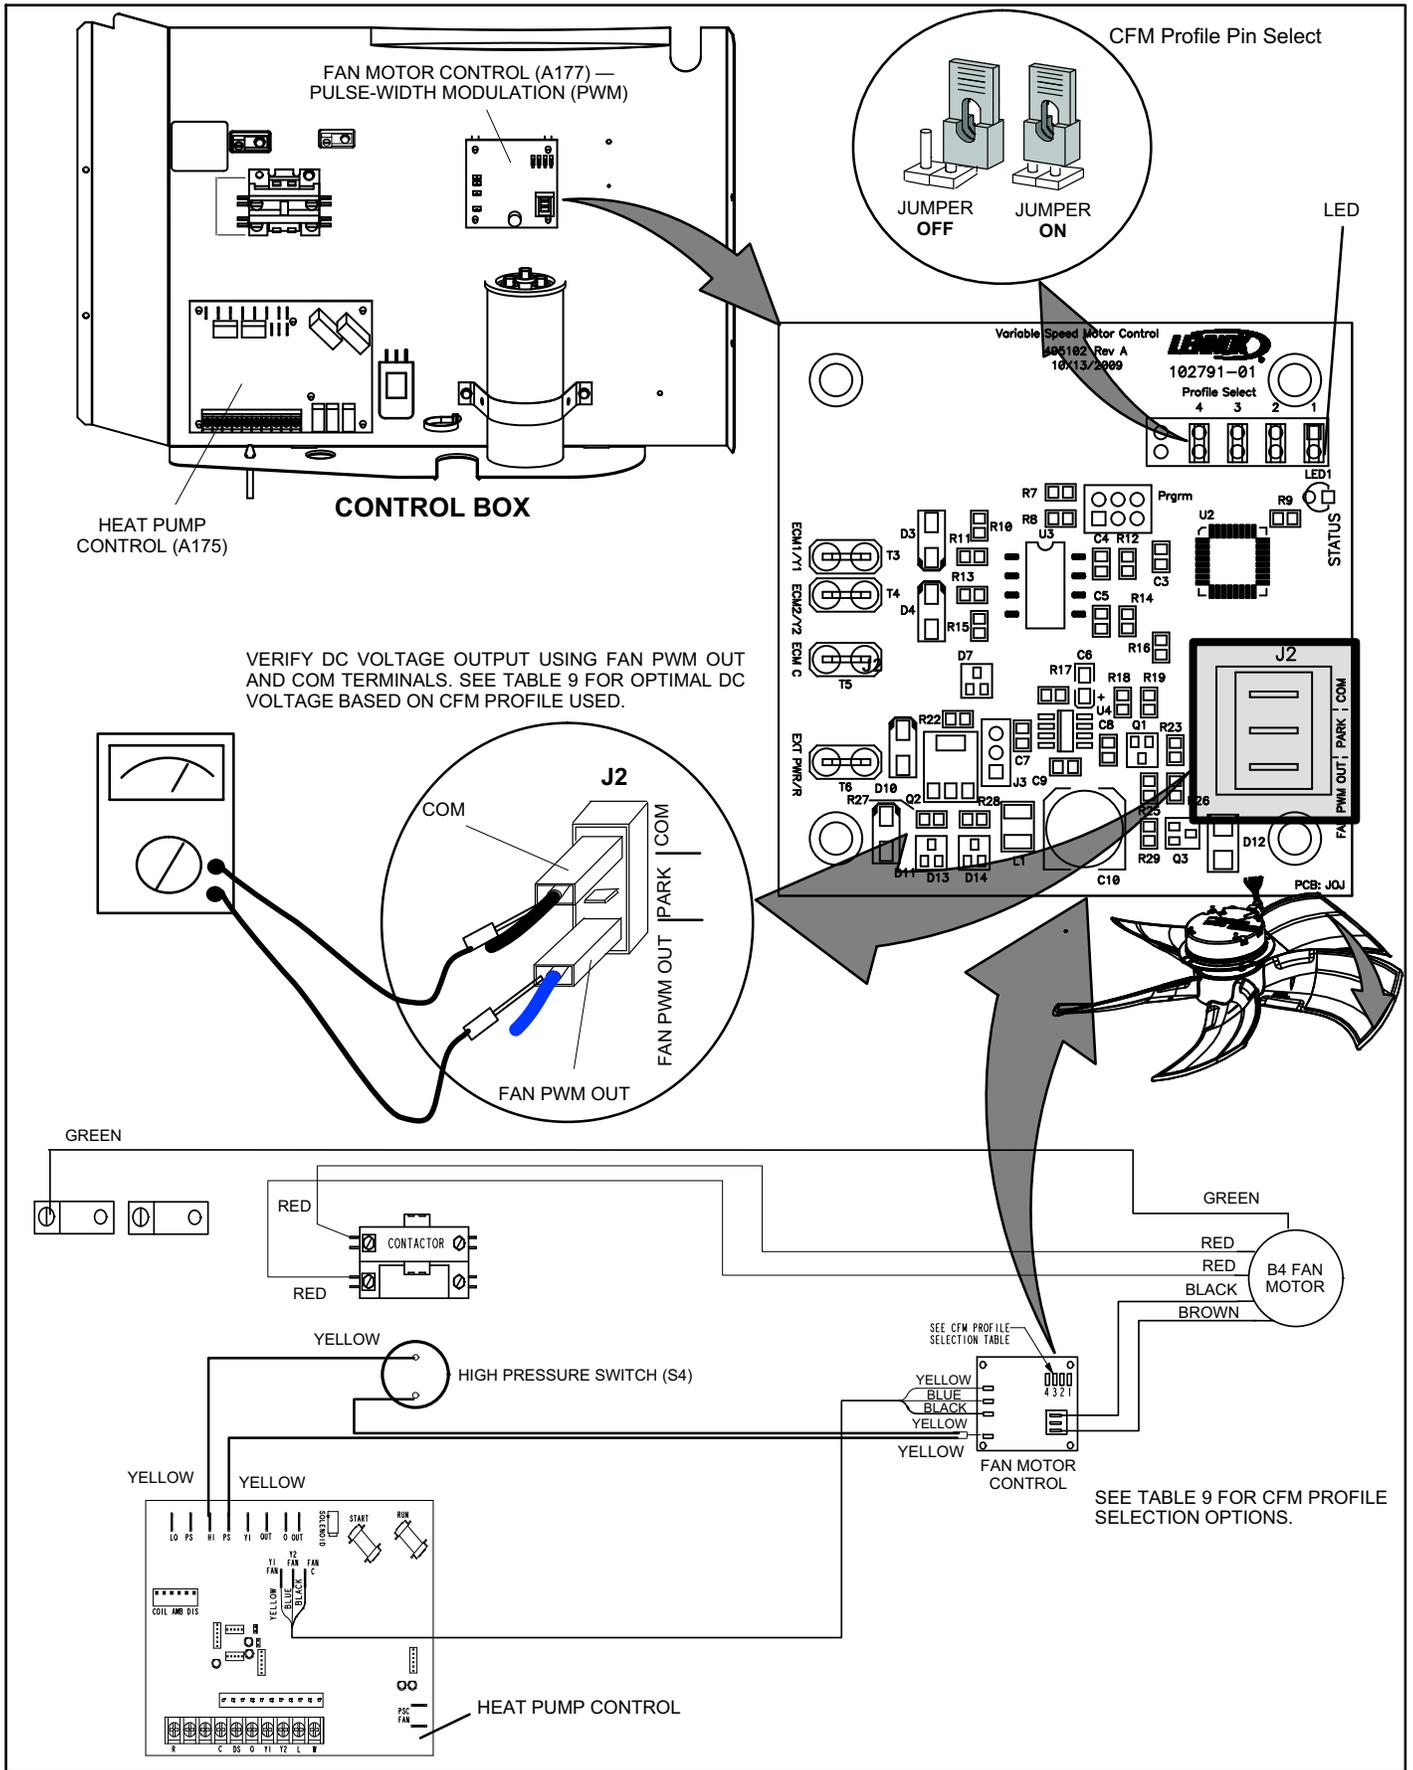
Fan Motor Control, Wiring, Jumper Settings, Testing and LED Location
